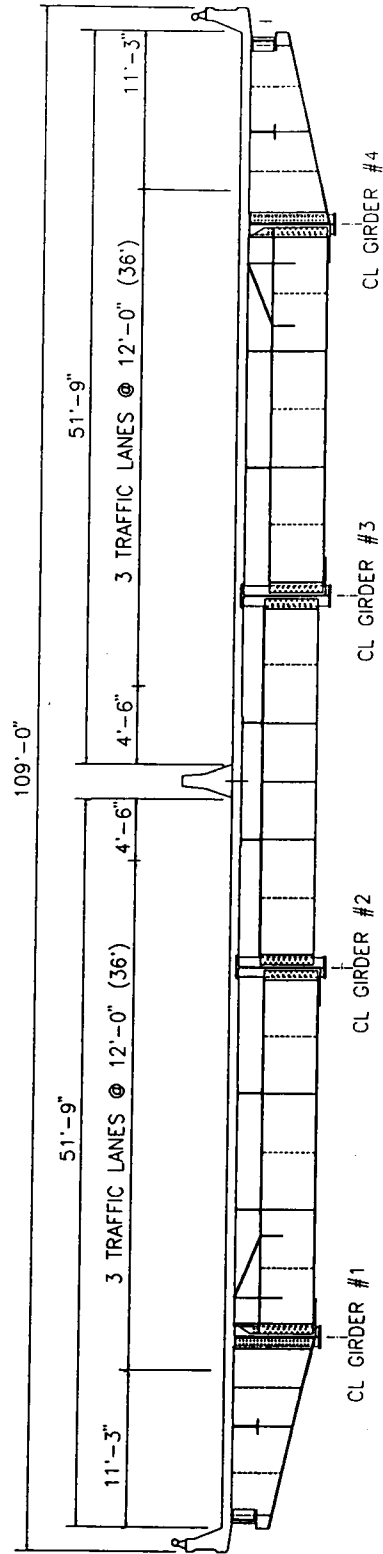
Cross section of the Holston River Bridge at floor beam
